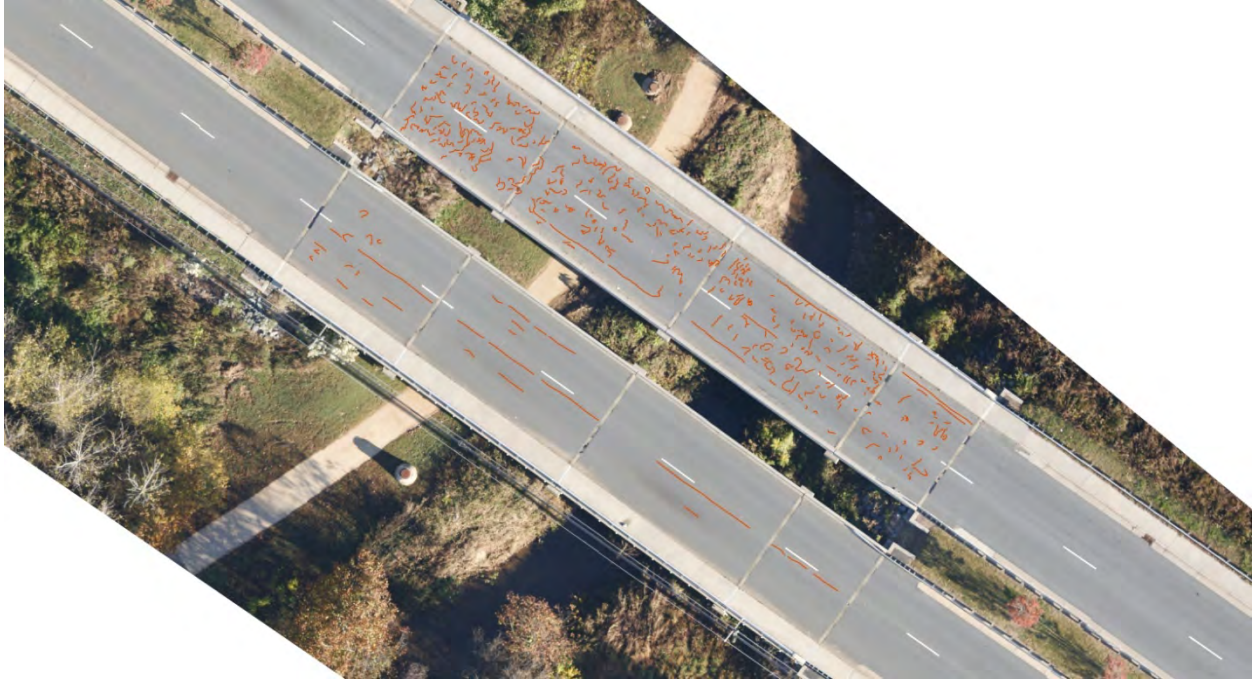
Mark-up of bridge deck cracking in Arc-GIS.
